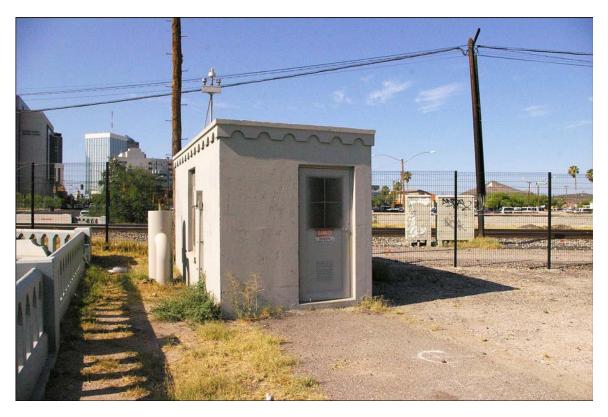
East and north elevations of pump house, Parcel Number 117-05-068F.
